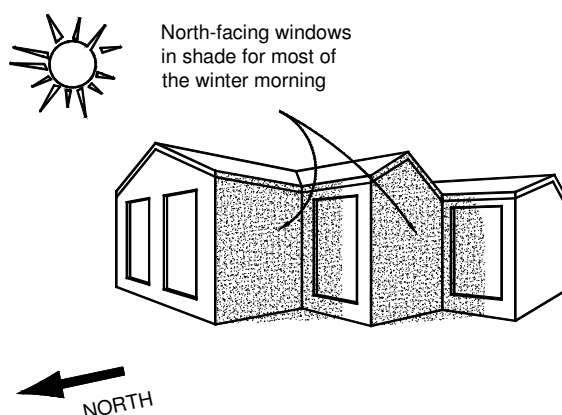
East and west-facing walls can shade adjacent north-facing windows in winter.
